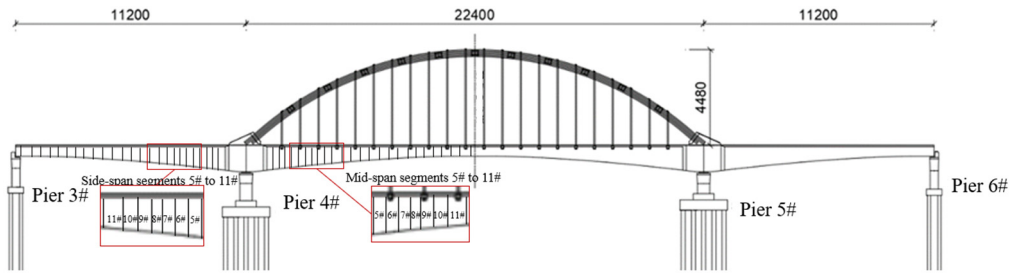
The structural diagram of Qingpu Bridge (cm)
